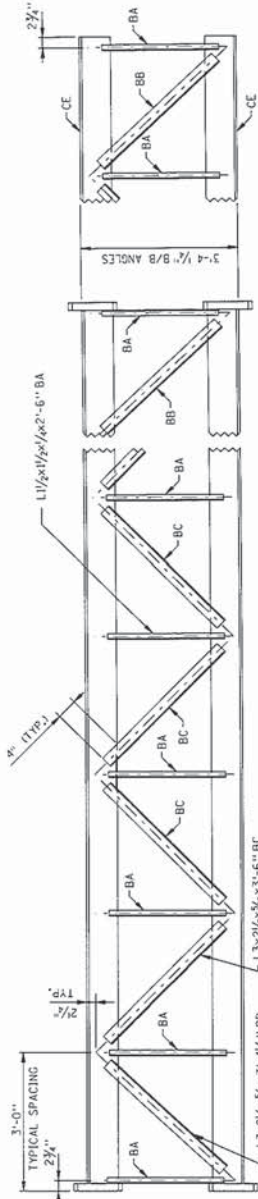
DETAILS SHOWN ARE FOR THE FREE ENDS OF THE CANTILEVER SPANS. ALL OTHER DETAILS FOR CANTILEVER TRUSSES SHALL BE AS SHOWN FOR THE SIMPLE SPANS.
